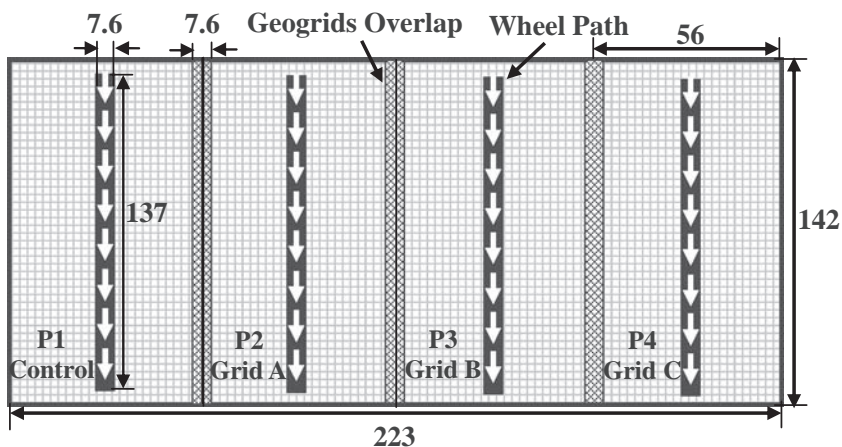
Sketch of the layout of the pavement sections; units are in cm.
